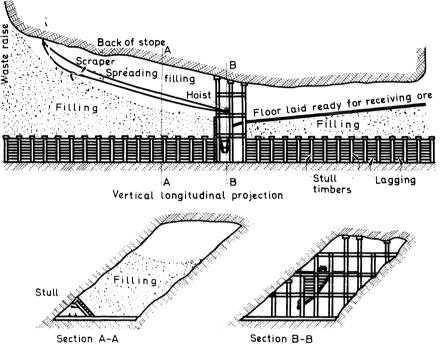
Cut-and-fill stoping on stull timbers, Park Utah Mine, Utah.⁽⁸⁾
